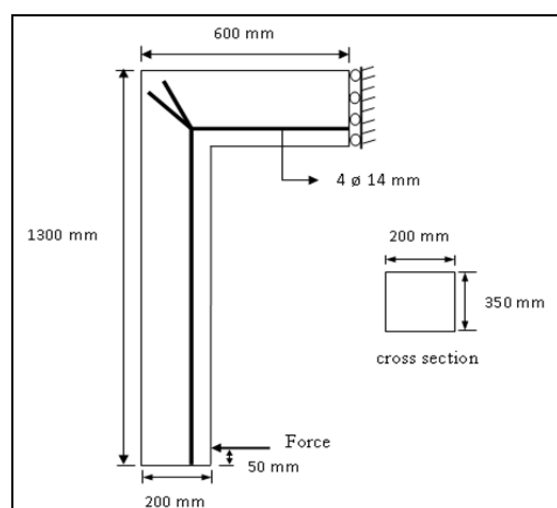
Reinforcement Detail with Stirrups (ST1).^[2]
